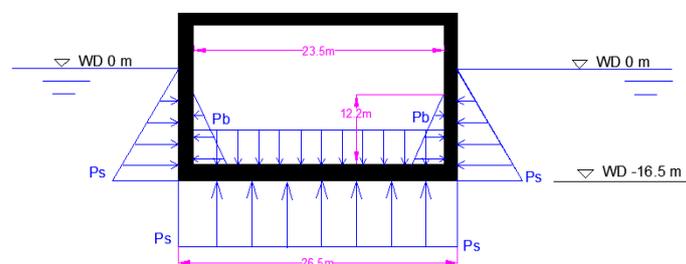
19. Hydrostatic force scheme during immersion to WD-16.5 m at final location
